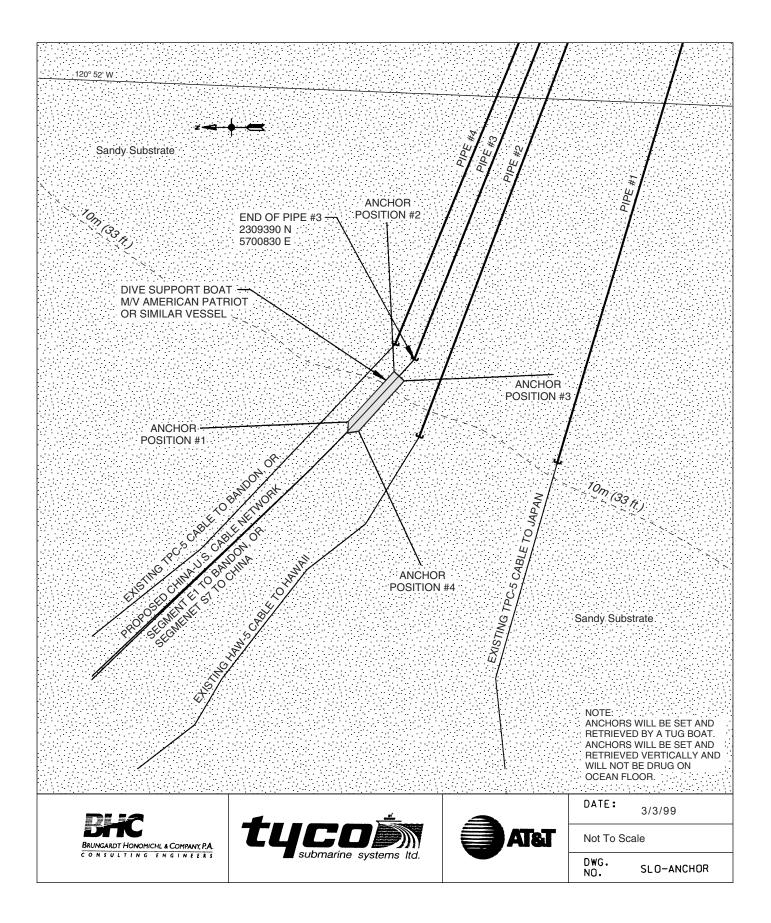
Schematic Anchoring Plan for Primary Work Boat During Nearshore Cable Installation
